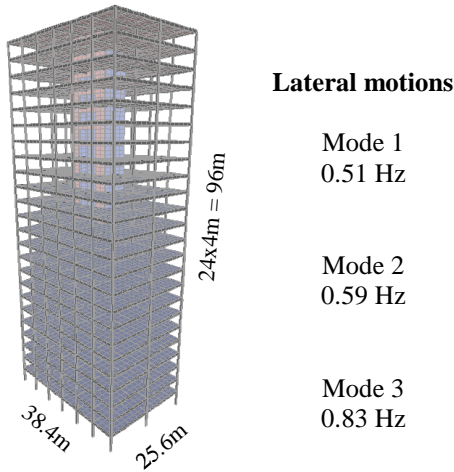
24 storey building moment framework of structural steel or RC, and CLT floor and roof slabs (modal frequencies shown for RC framework)
